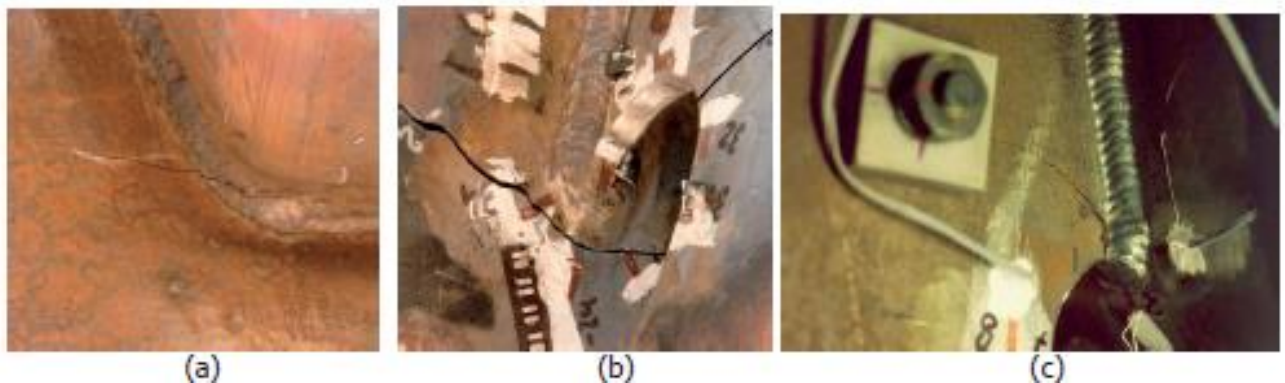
Failure modes continuous trough to crossbeam connection (Kolstein, 2007)
